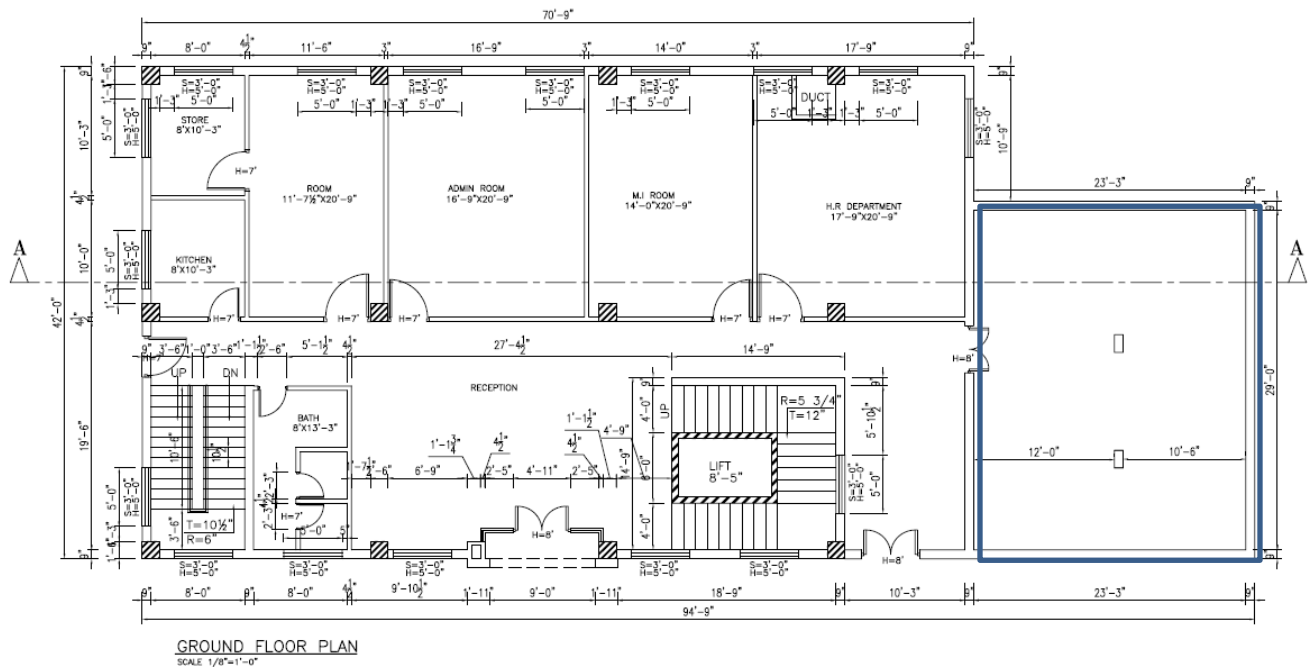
Architectural Plan of CFL Admin Block Ground Floor (Highlighted Part is showing URM)
